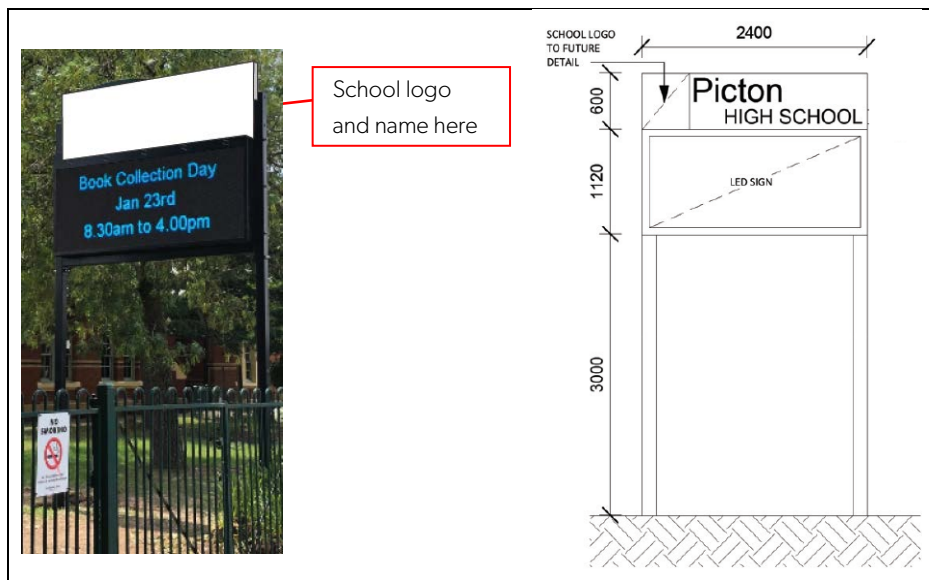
| Proposed signage (source: Section 4.55 Modification Application, 2019)
